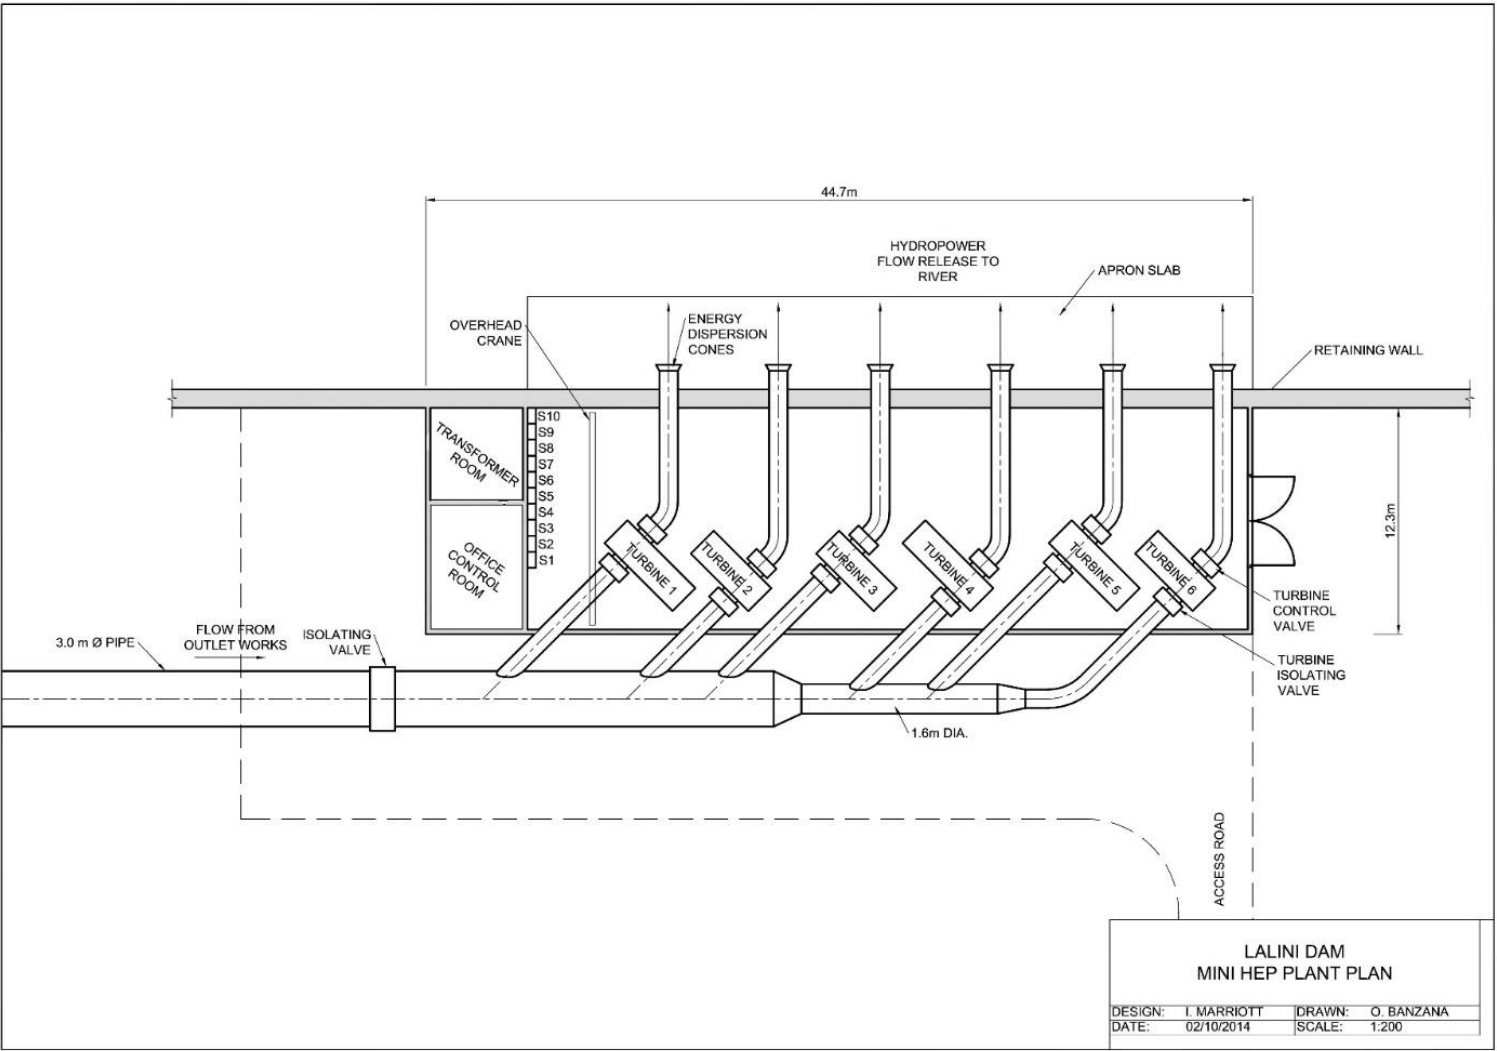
Proposed Layout of Lalini Dam HEP and EWR Discharge Point
